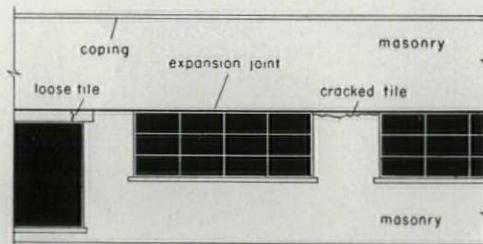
Movement above door head cracks the joint above door jambs, also the tile between windows.
